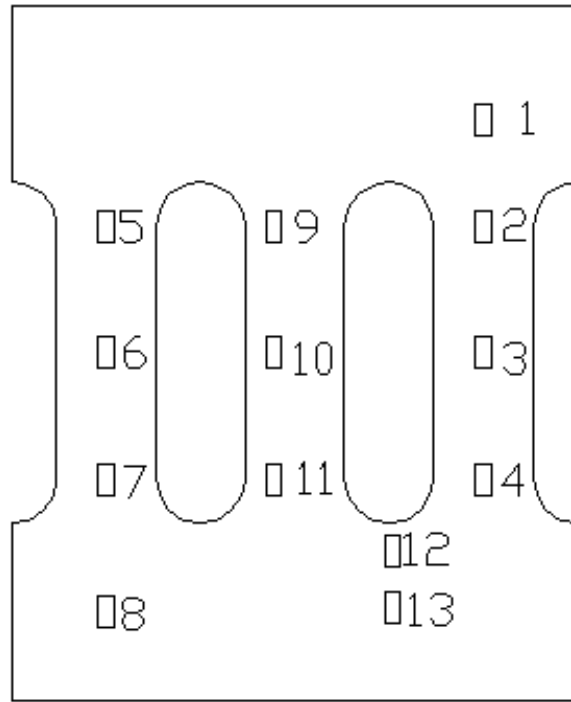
Strain Gage Locations on Cyclic Loading Test Specimen.
